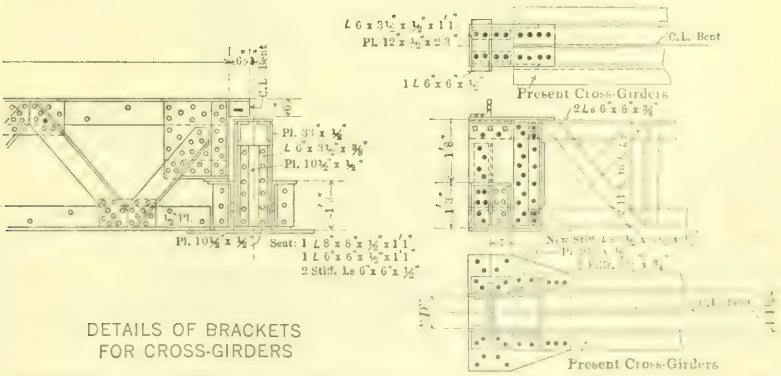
shows the details of the cross-girder extensions and the new track stringers. Two vertical plates were riveted to the flange angles of the lower girder and extended beyond it the full width of the new seats. Two vertical diaphragms stiffened these plates, one at the cross-girder end and the other at the center of the seats. Angles were riveted to the top and the bottom of the vertical plates, and were connected to the top and bottom flanges of the cross-girder by horizontal splice-plates. Regular seats were provided on the vertical plates for the new track stringers. The track stringers were lattice girders, in order to conform to the existing stringers.
